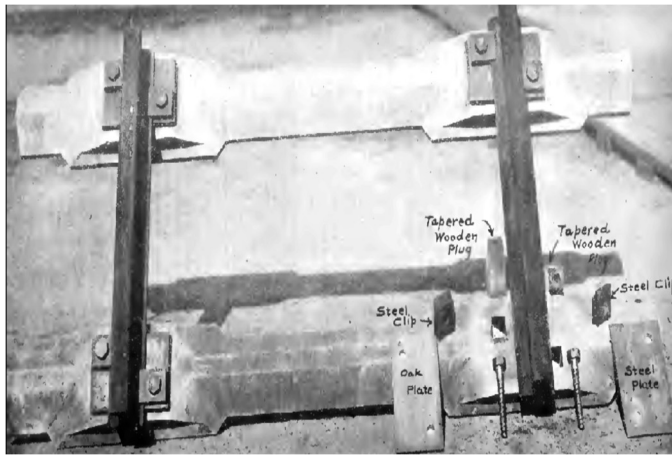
Example of a reinforced concrete tie with steel and wood plates built at the Pittsburgh & Lake Erie rail seat
